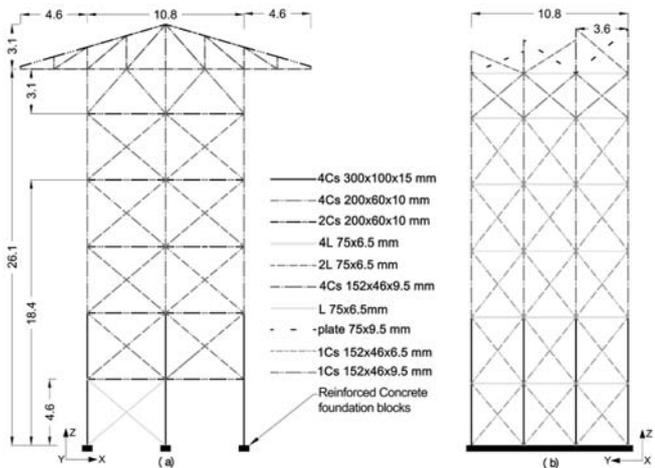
Structure 2; front view (a) and side view (b), dimensions in meters.
